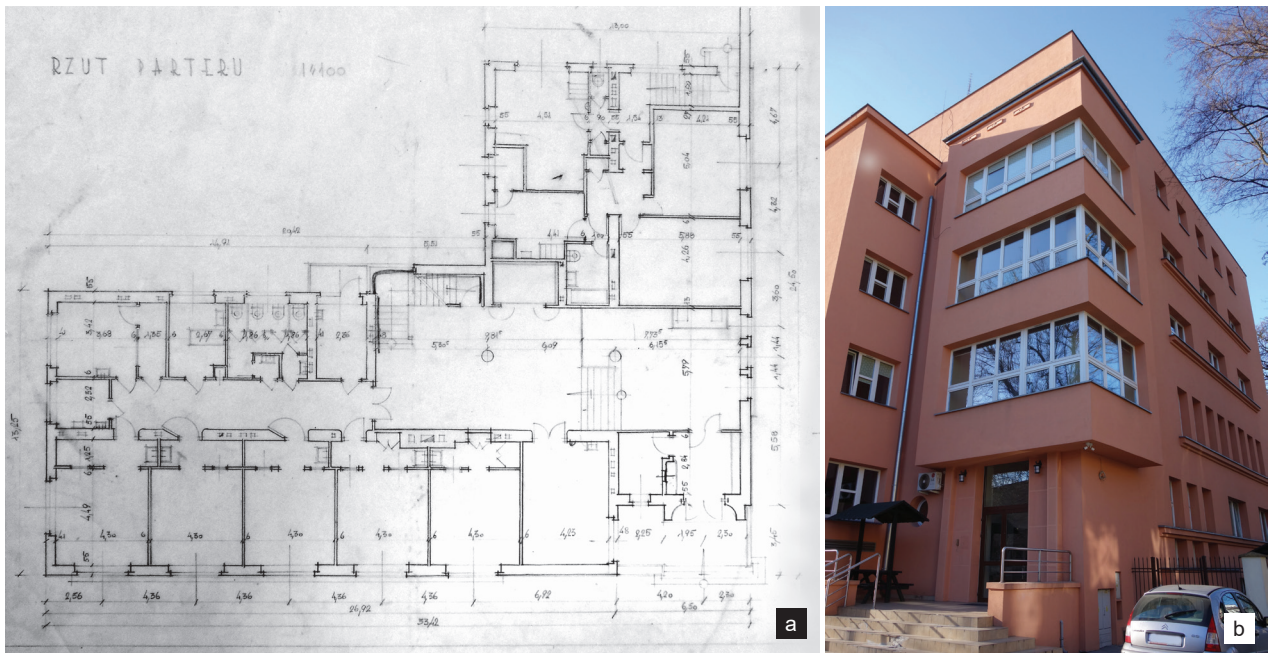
Building at 6 Chmielowskiego Street: a) the ground floor plan (source: ANK, ABM, TAU, BUP, 6 Chmielowskiego Street, Fasc. 24P2214), b) the tenement corner (photo by M. Motak)
